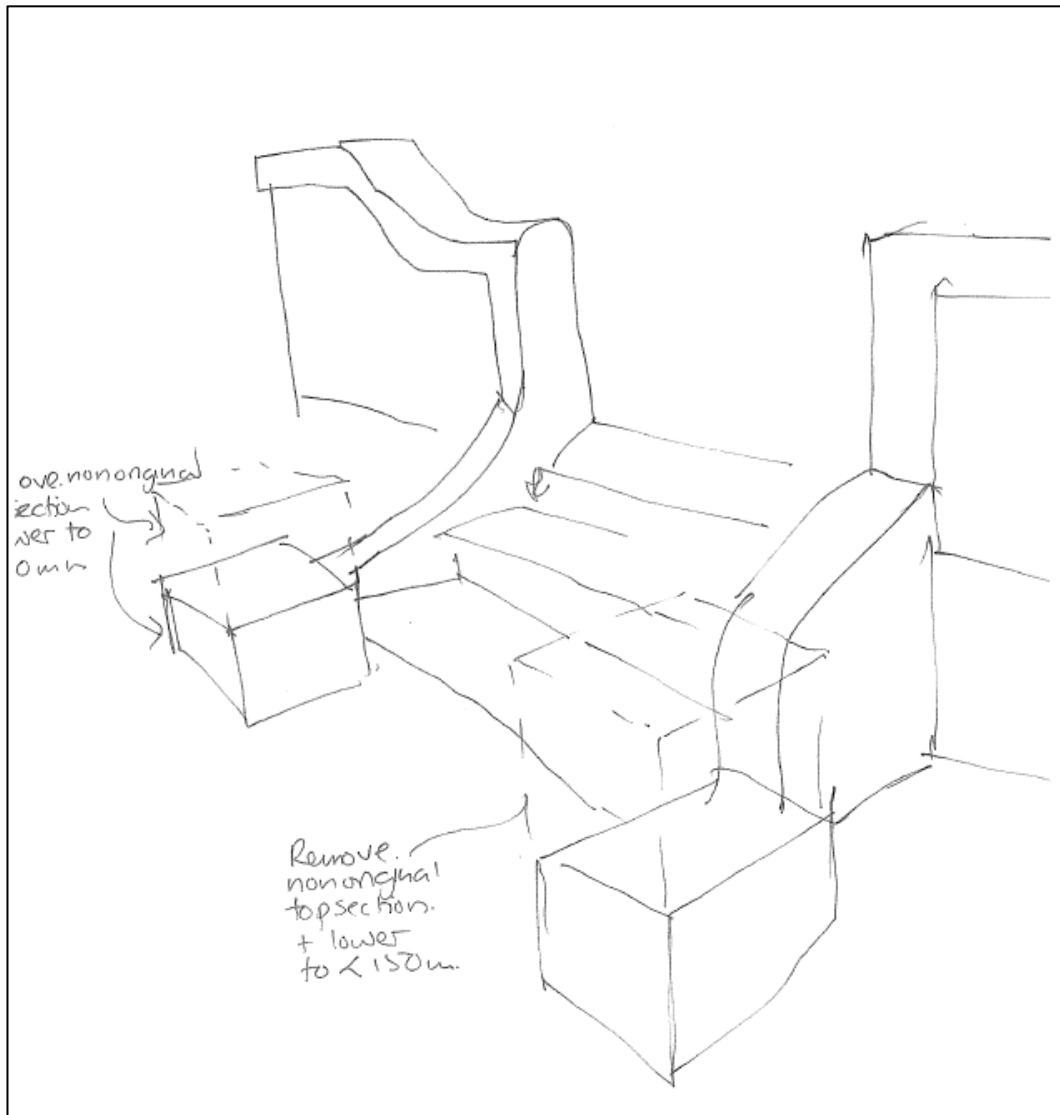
Sketch of eastern verandah stair (Source: Applicant)
